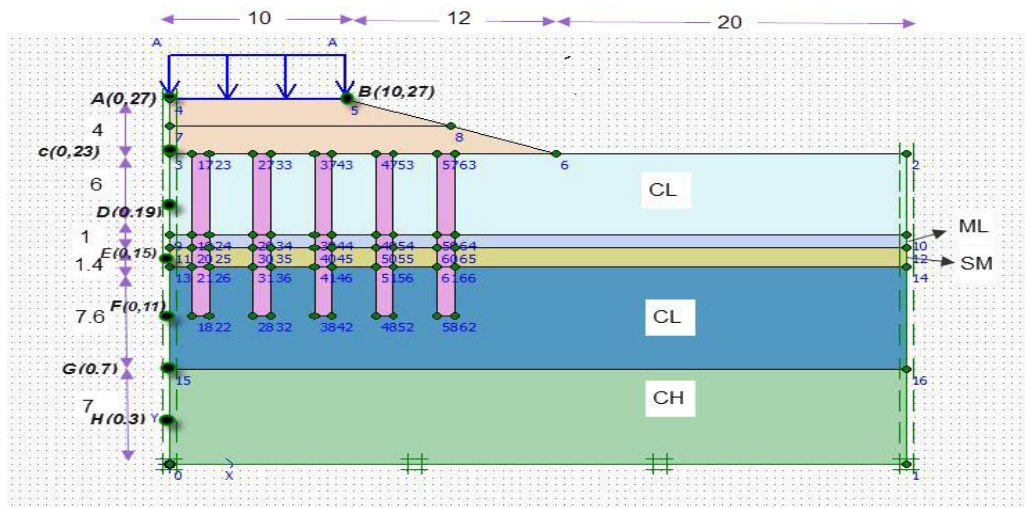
Cross section of stone columns under embankment (All dimensions in metres).
